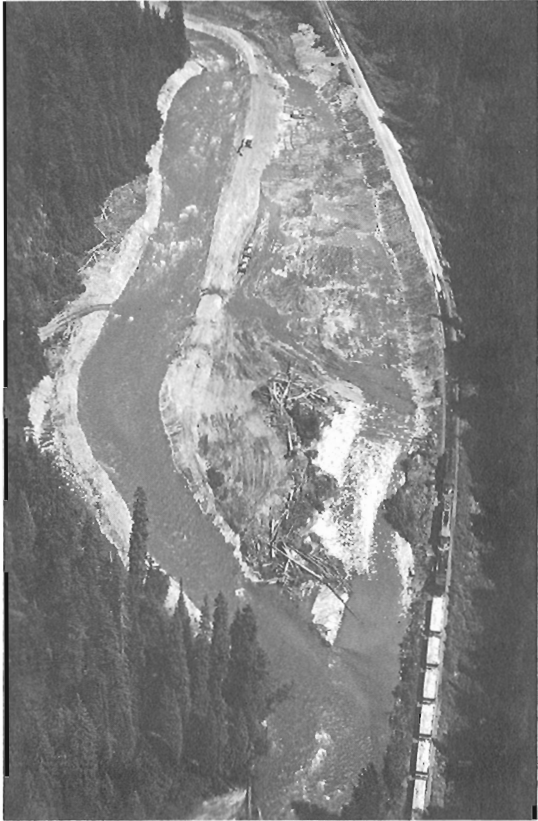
Reconstruction of washed out Canadian Pacific Railway track in Illecillewaet River valley, July 18, 1983. Note light colour of rebuilt track bed (upper right), construction of protective riprap dykes, and rail wagons full of rockfill material (lower right). (GSC 203993-M)
